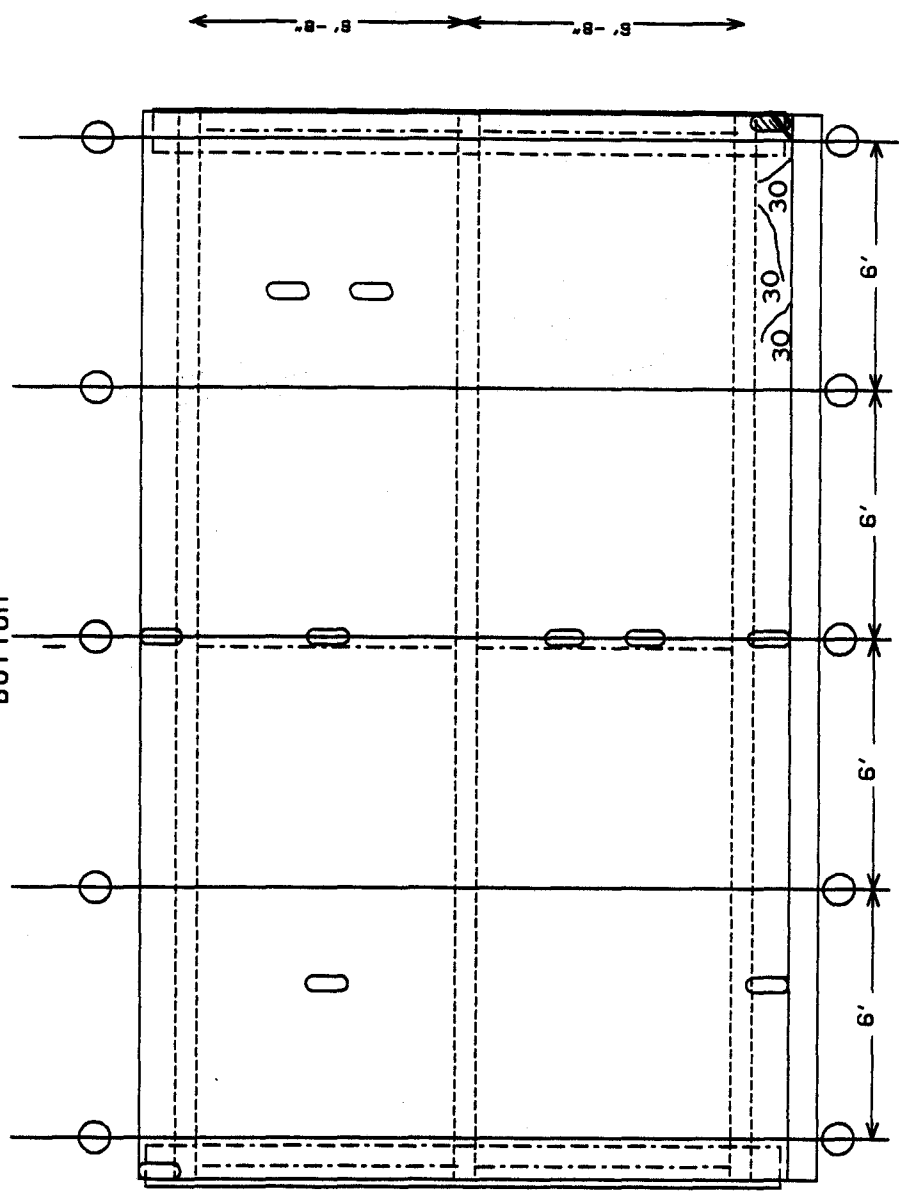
Bottom Cracking Pattern (First Bridge - Test No. 6)
